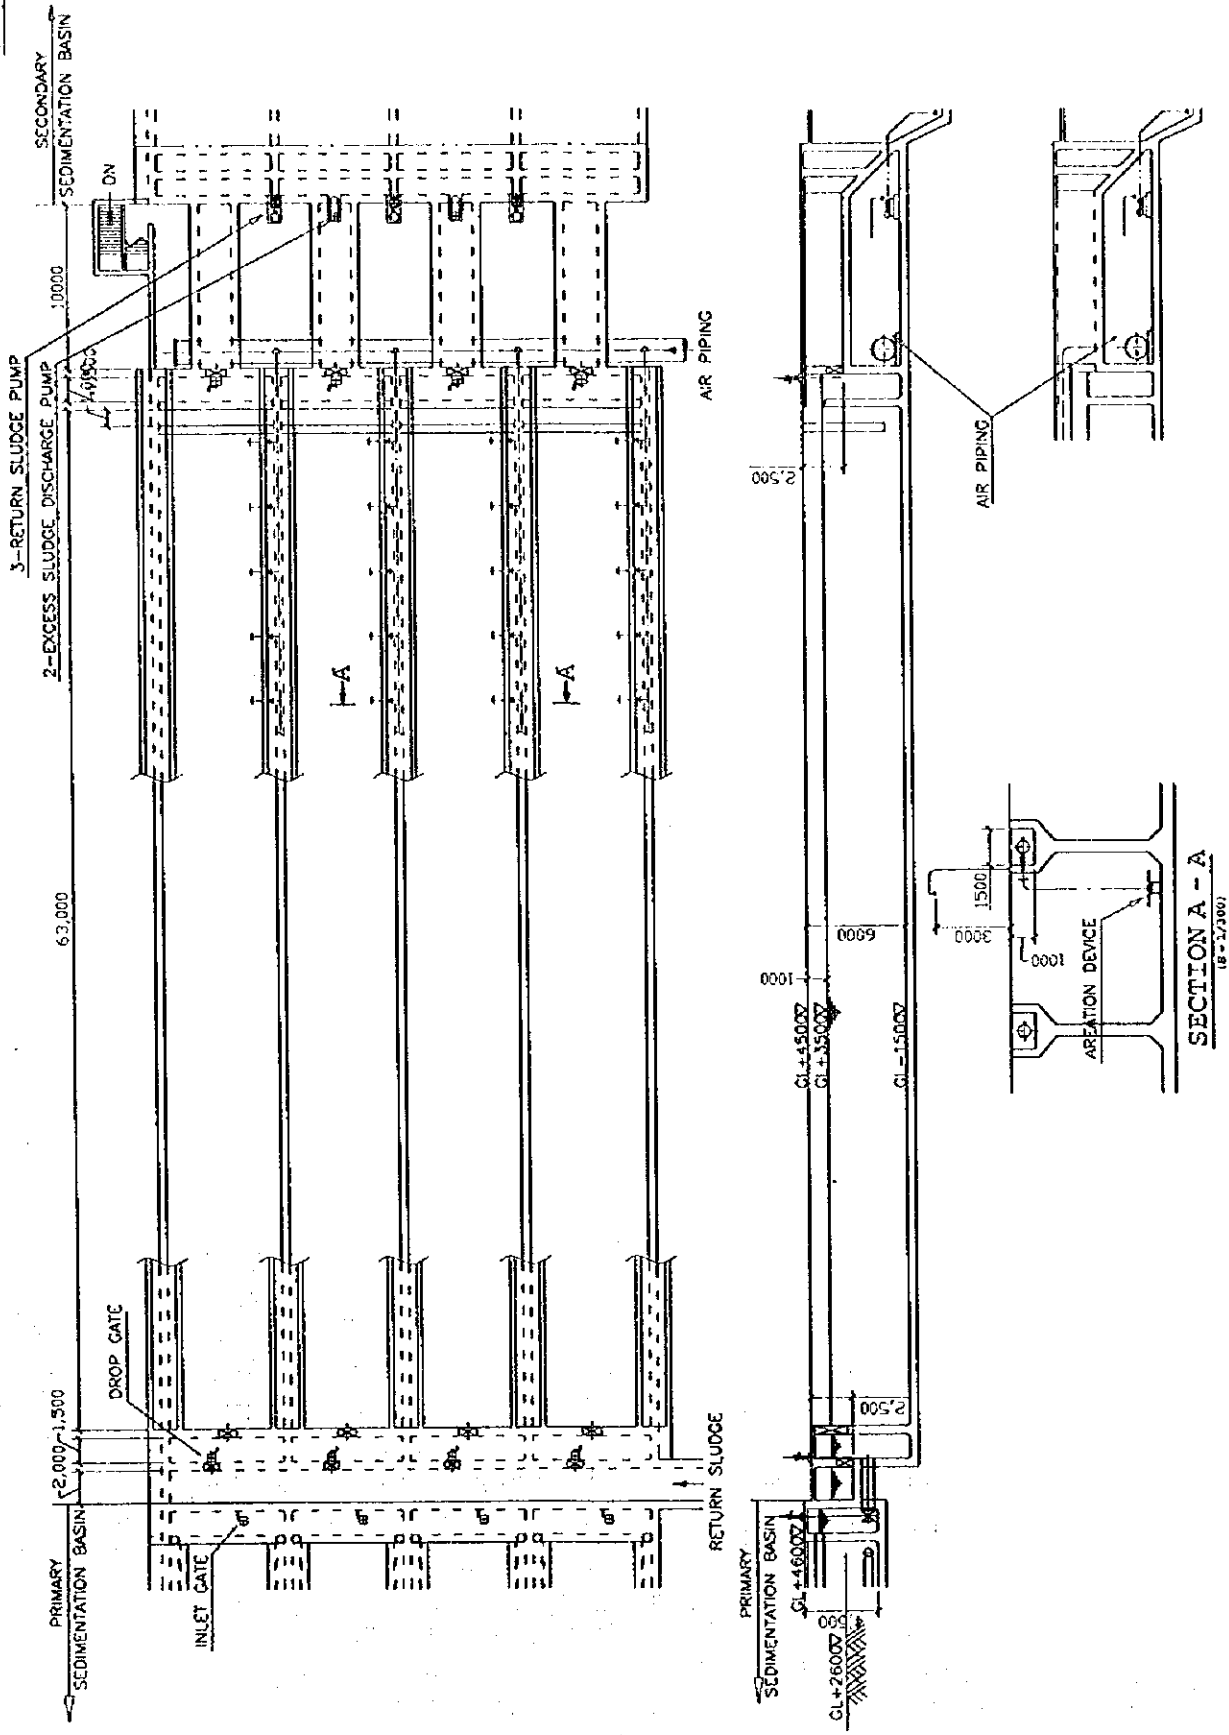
PROPOSED LAYOUT OF AERATION TANK
